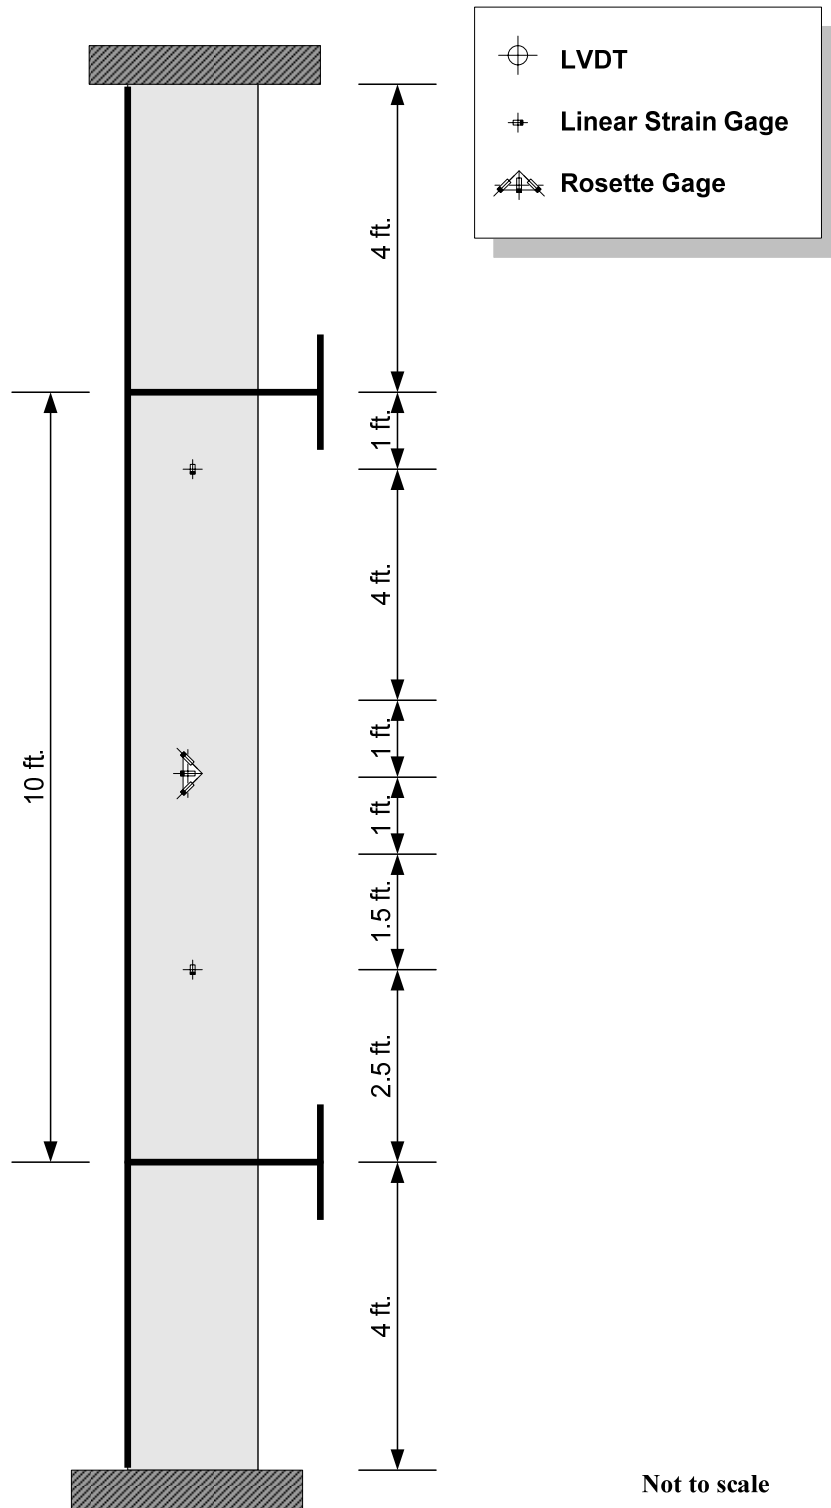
Instrumentation Plan for Single Rib Column, SC
